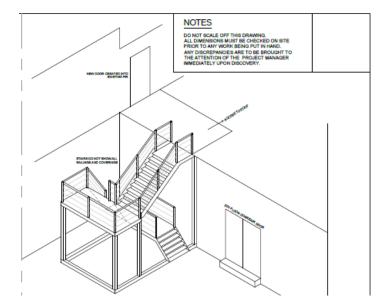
Extract of drawing ref. 067-M01-001 showing the proposed staircase and door.
